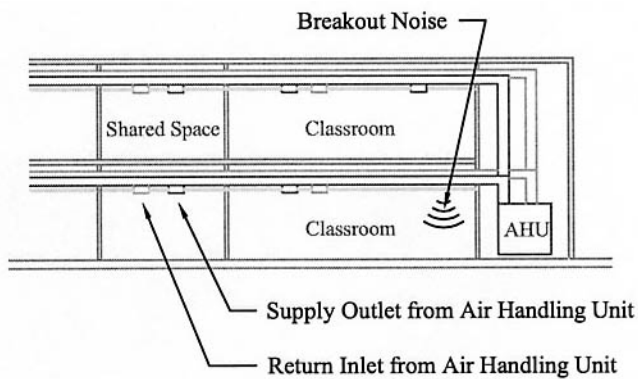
Conceptual section sketch of Case Study 5: Central AHU Systems with Clustered Plan
